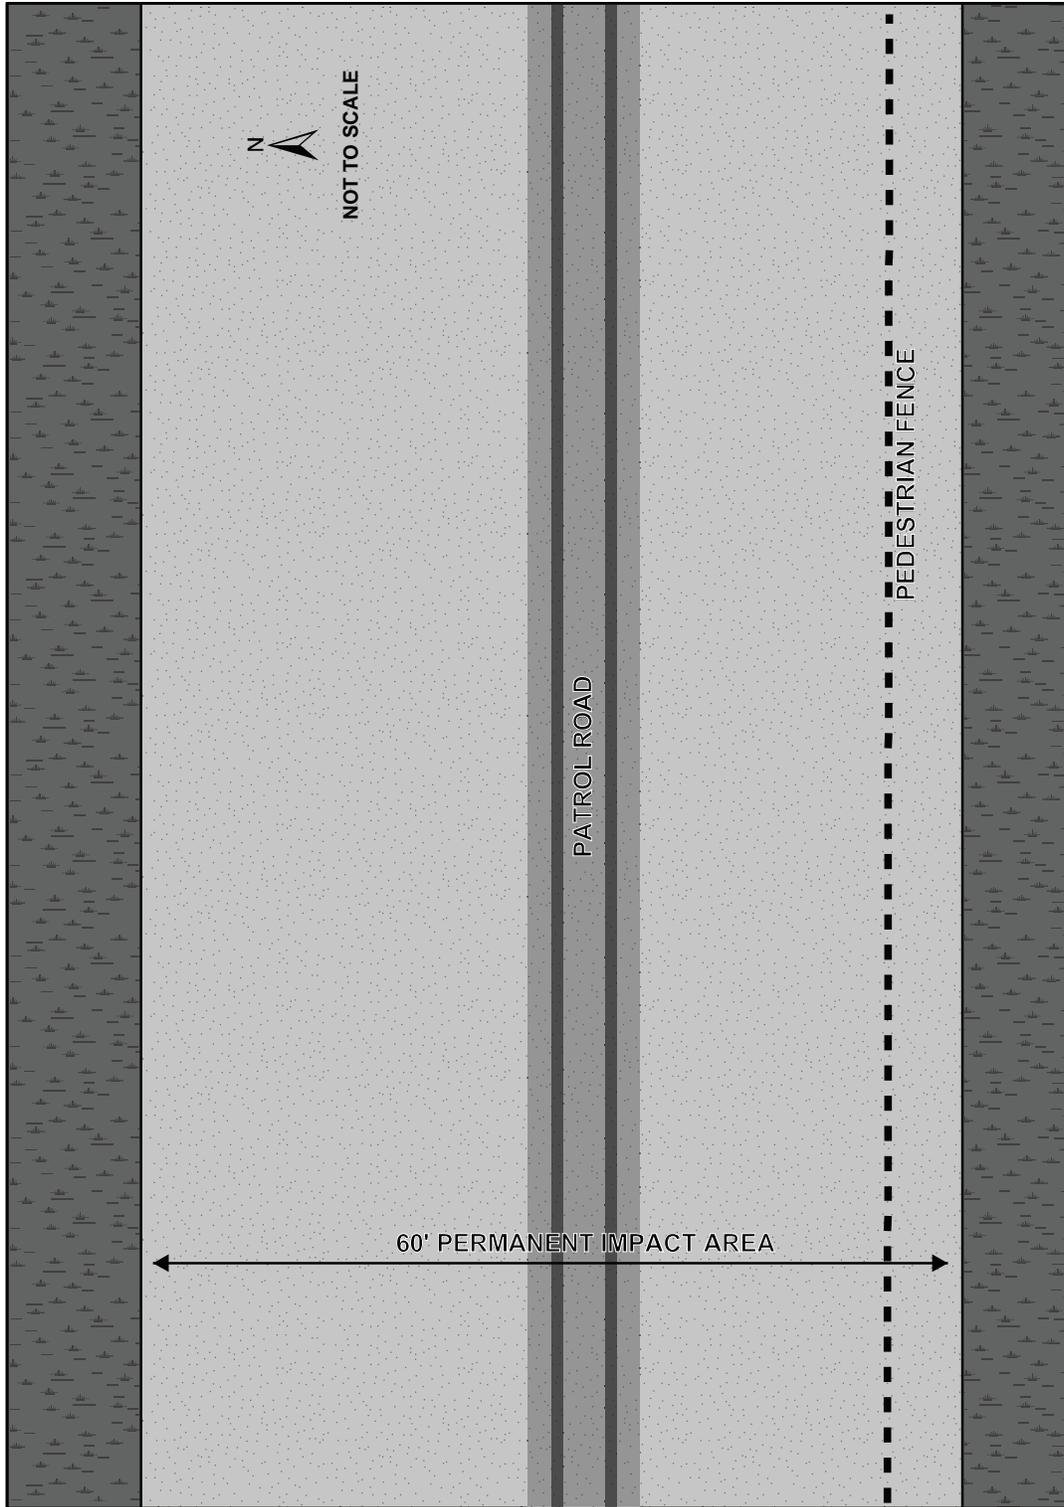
Schematic of Typical Proposed Project Corridor – Alternative 2, Section M-2A
